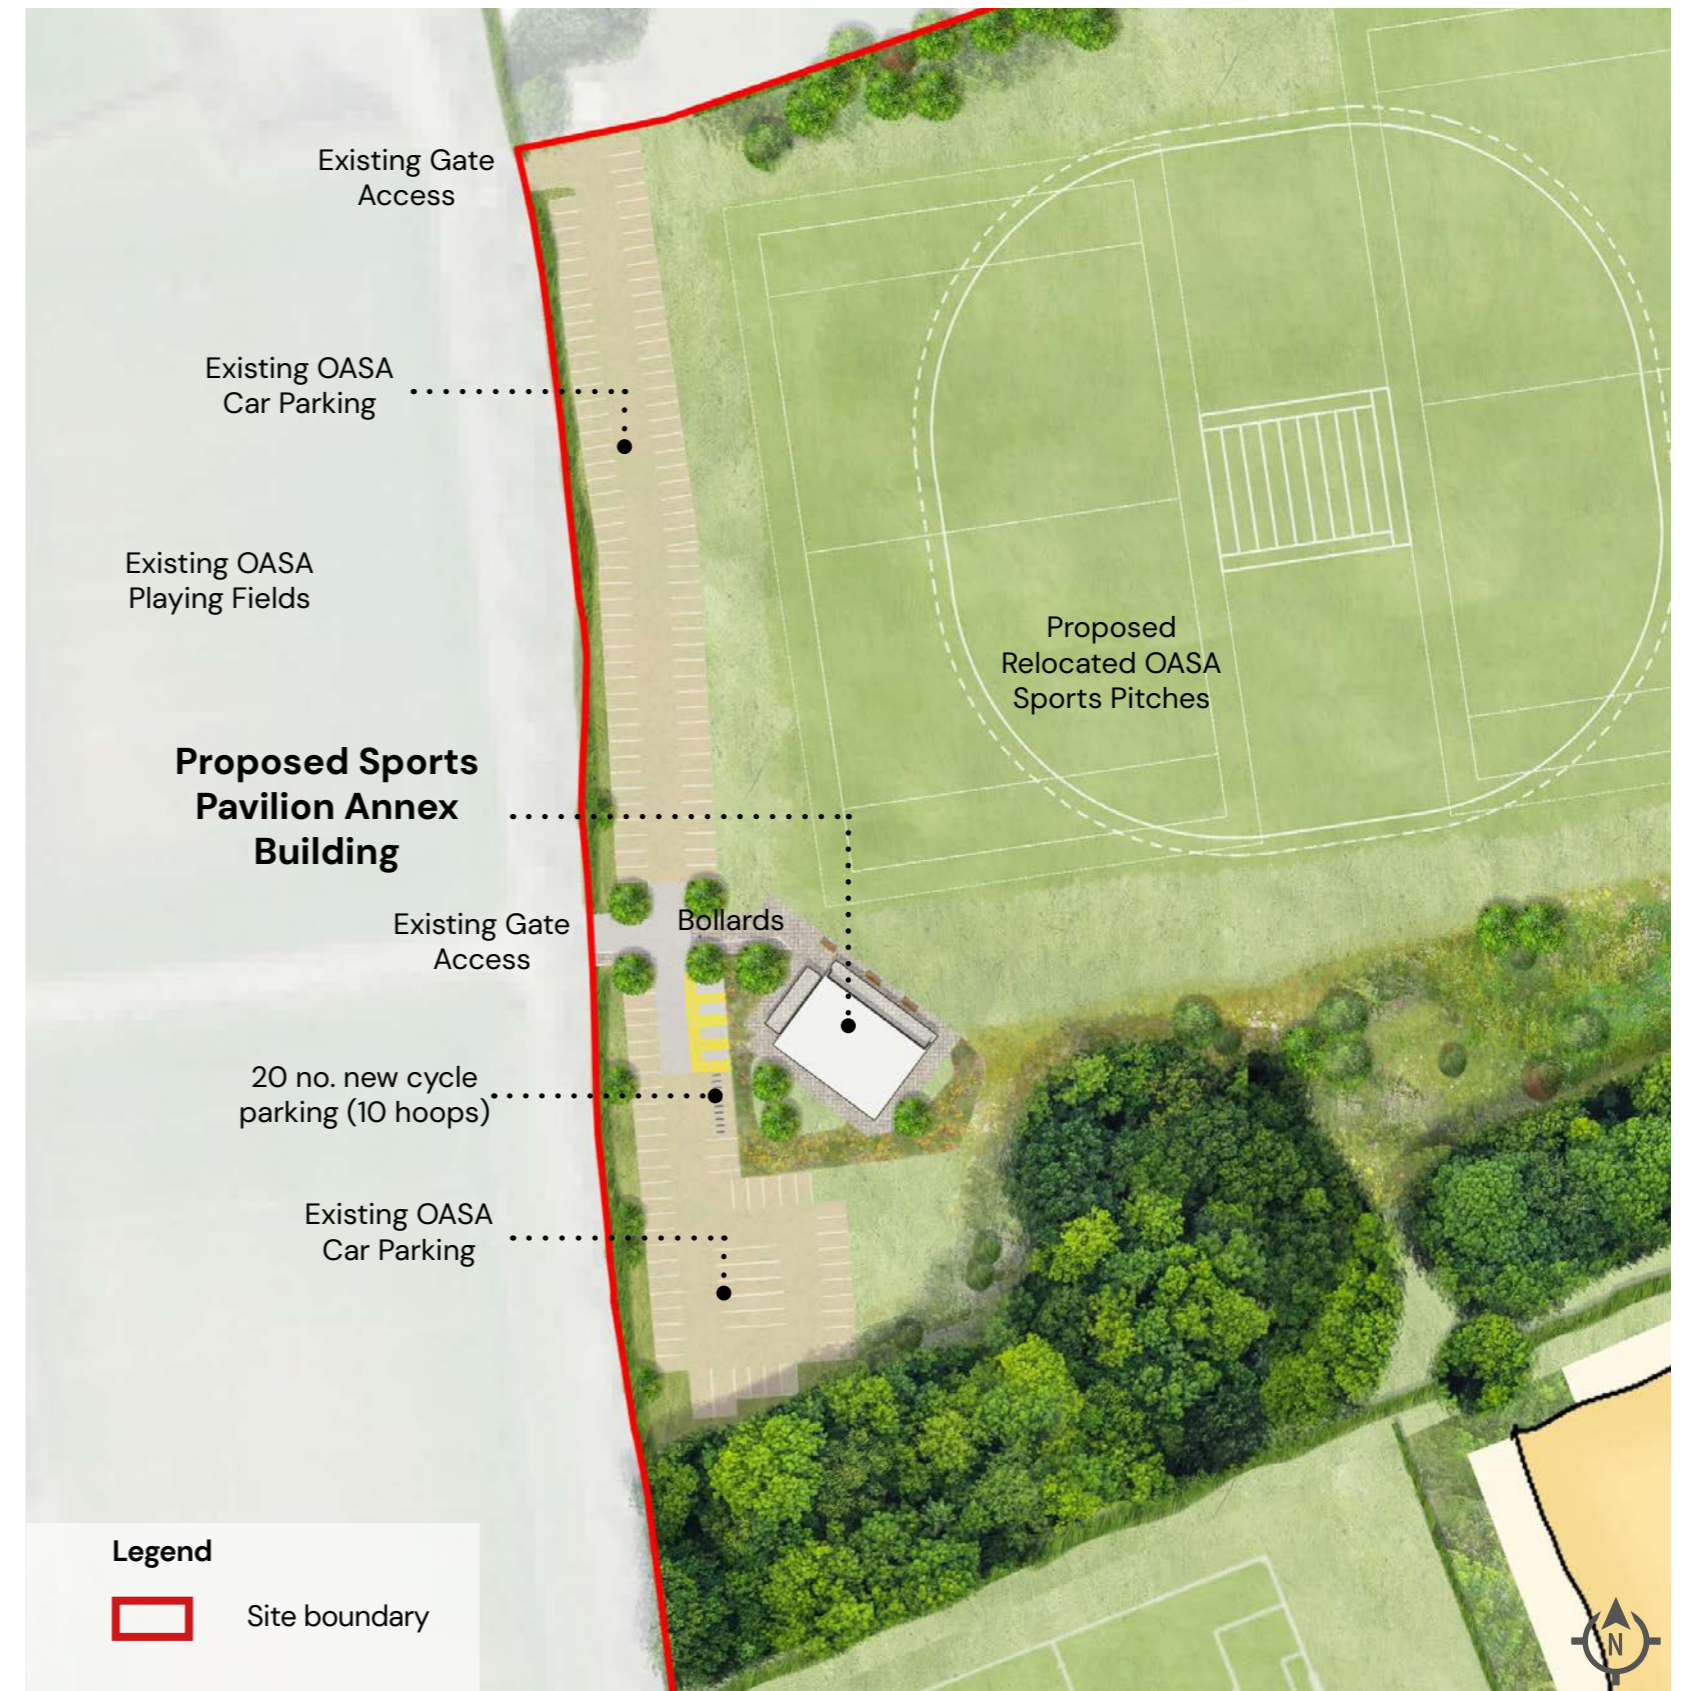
AMENDED SPORTS PAVILION ANNEX PLANTING PLAN
